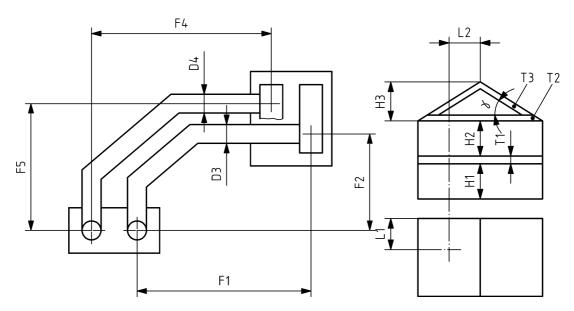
Example for connecting flue pipe and connecting air supply pipe dimensions for C4 application with separate ducts.
